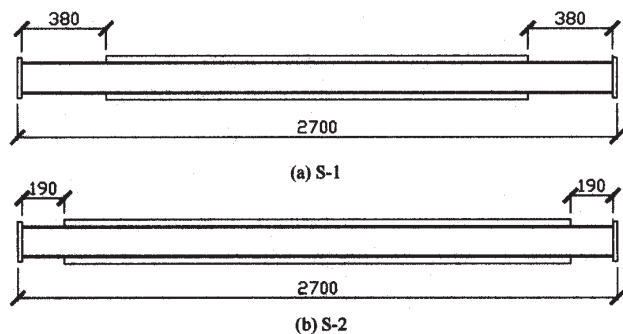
Column specimens with damaged fireproofing (figure courtesy of G.-Q. Li).
